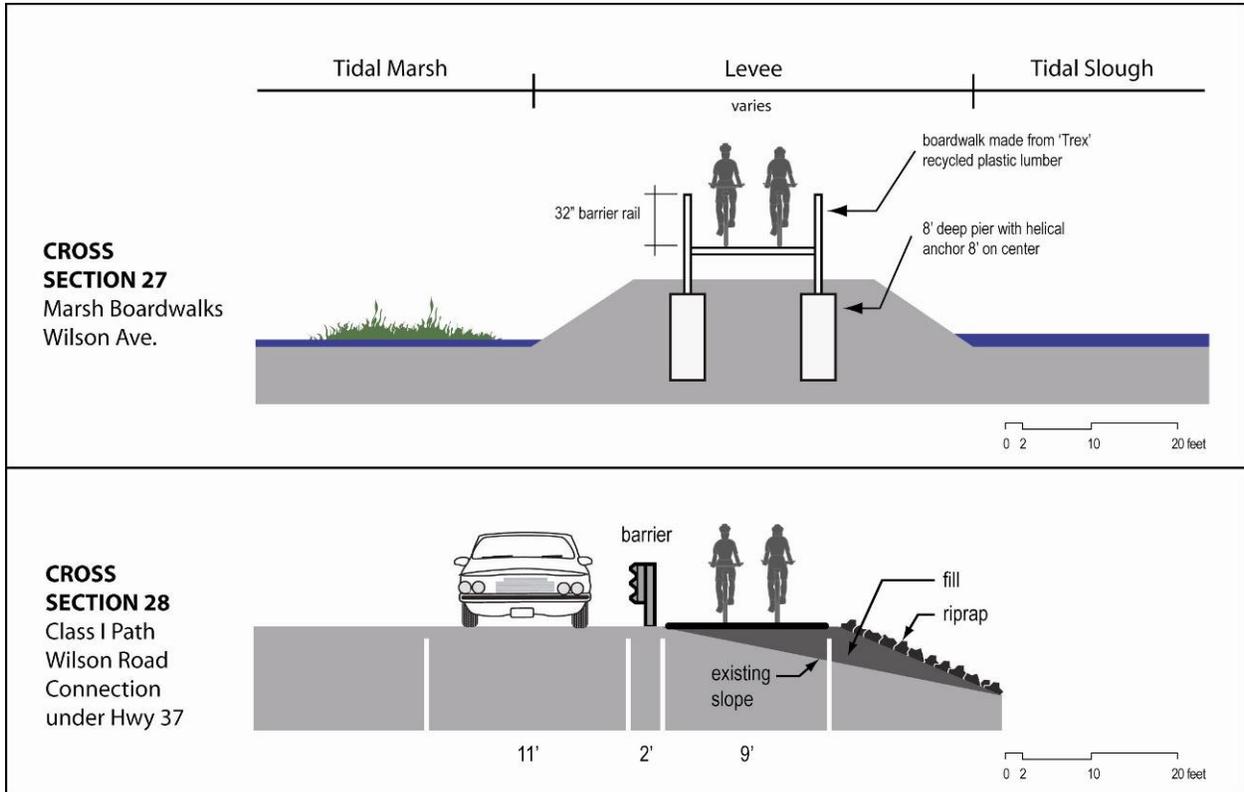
Napa Valley Greenway Typical Cross Sections
